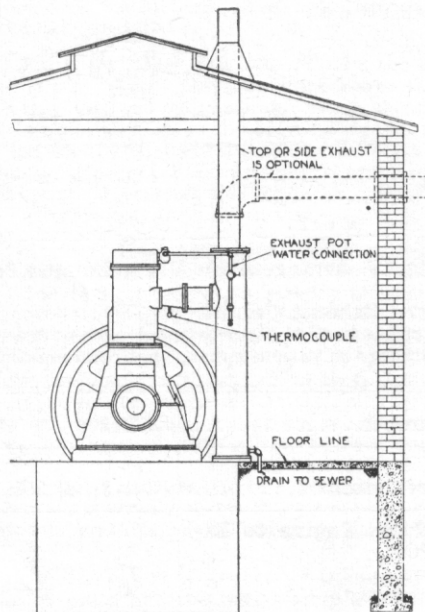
Exhaust Pot Arrangement (99YKA63)
